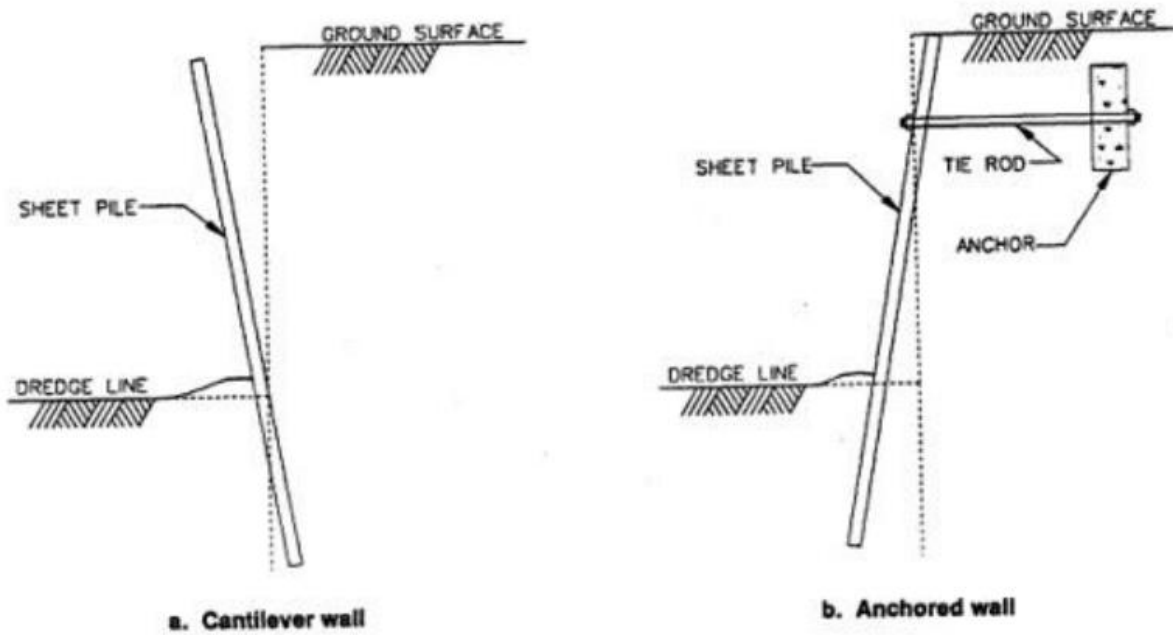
Rotational failure of cantilever and anchored sheet pile wall [29].
